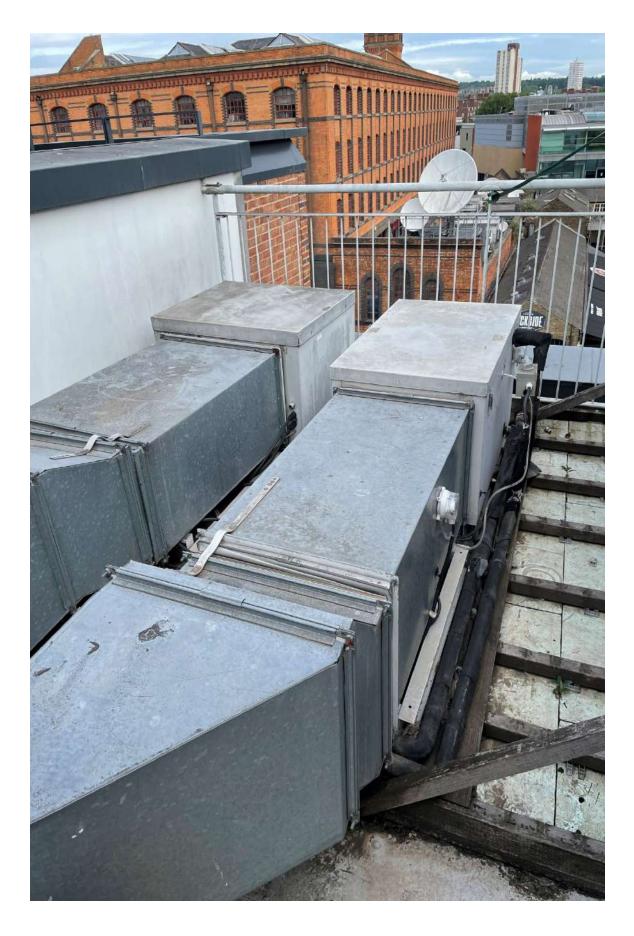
Photo G - Existing Extract ventilation units at the rear on the West side of the Hotel roof
